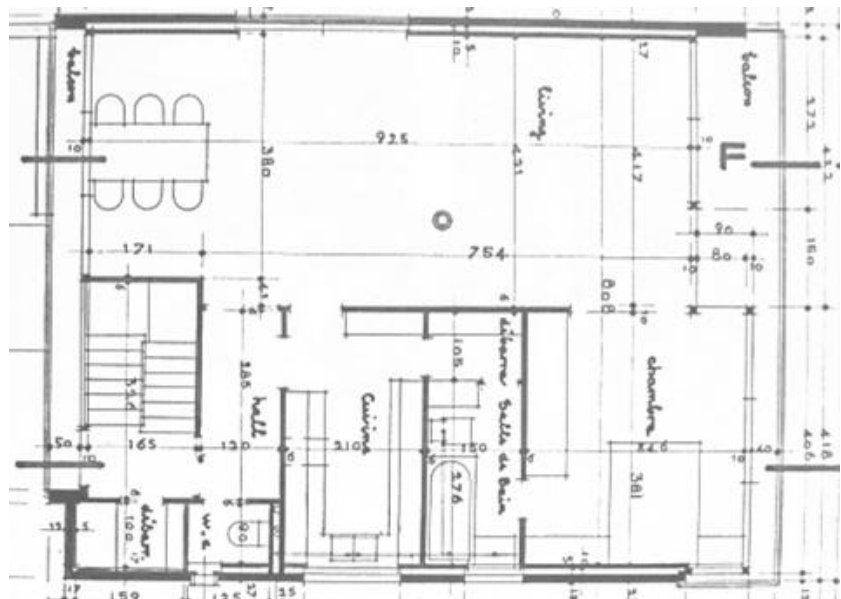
Floorplan of the upper apartments (addition of 1968)
